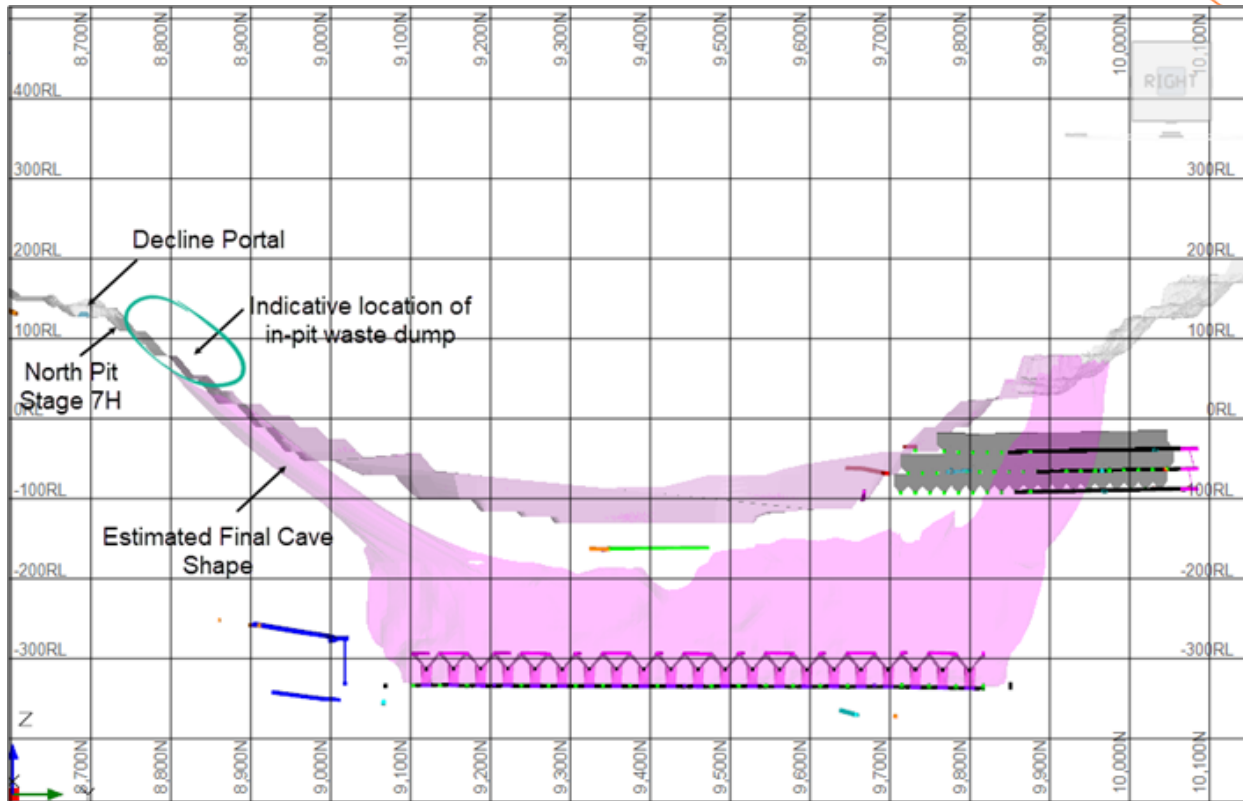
Indicative vertical section through final cave shape and North Pit Stage 7H
